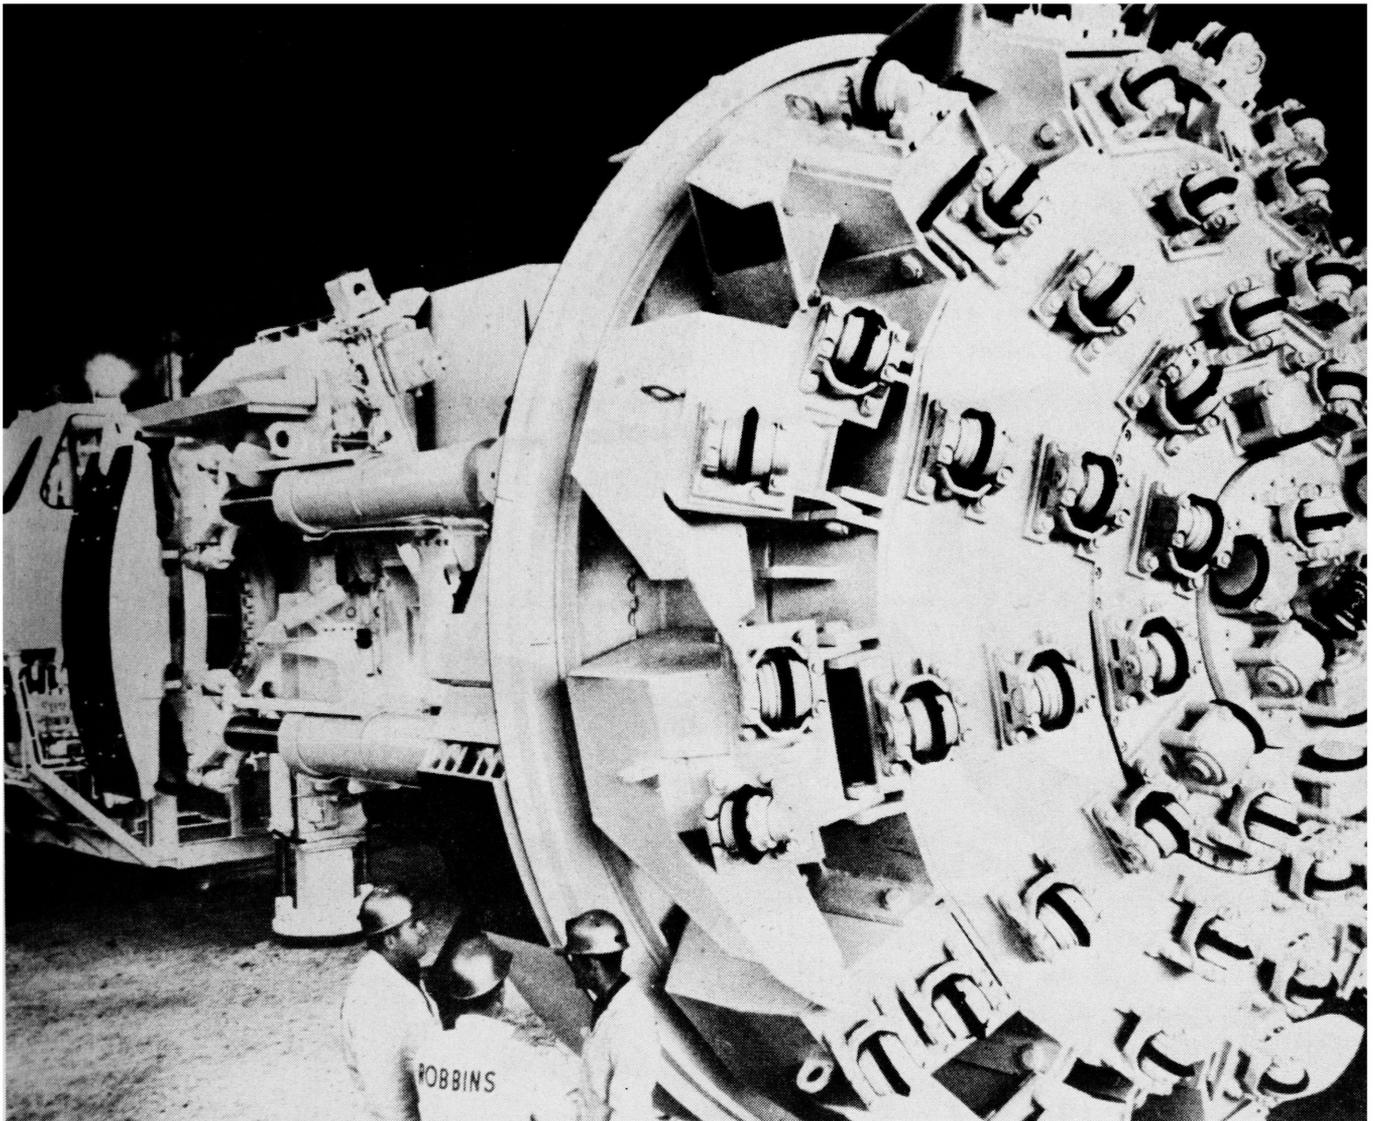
Eighteen-foot-diameter tunnel boring machine (3). (Courtesy, The Robbins Co.)
